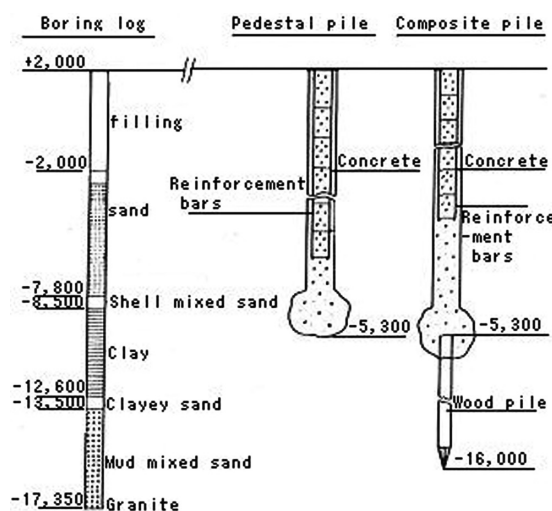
Foundation piles for Kukioka No. 1 Blast Furnace
